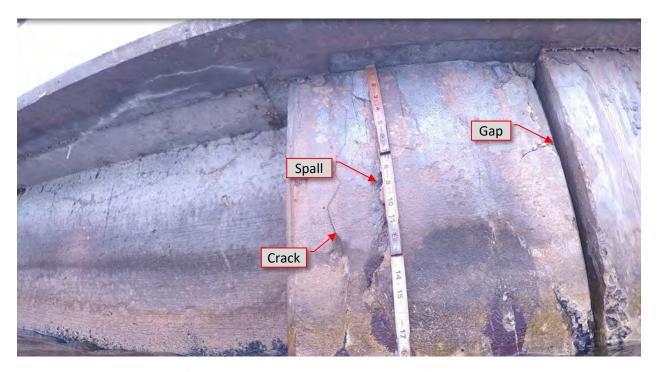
P44. STA 6+07. Cracks/spalls at both flanges at pile. Gap at construction/expansion joint.
